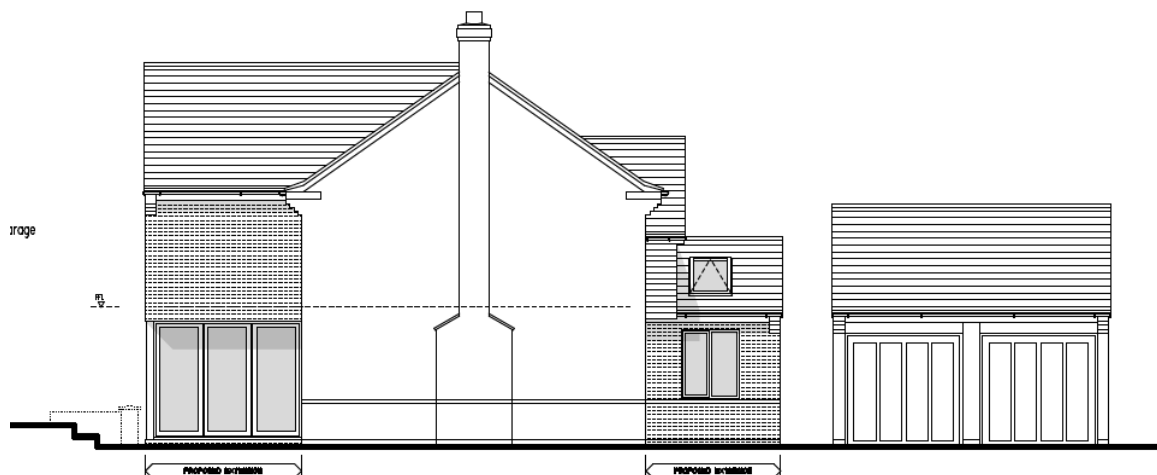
Rear Elevation (South) facing 2 Burghley Close (Under PD)
